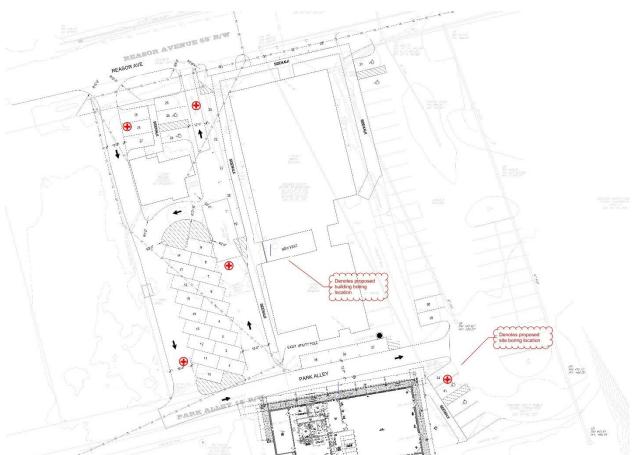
Site lay out drawing showing proposed parking lots, canopy, vestibule and boring locations.
